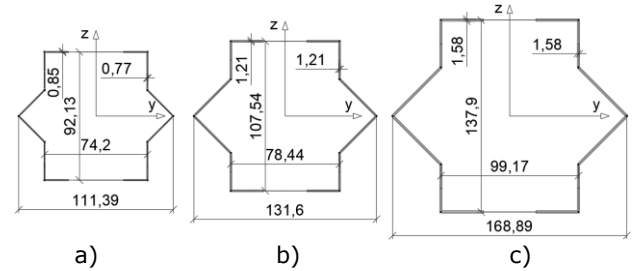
Cross-section geometry of optimized Type C column: a) – column under 50 kN axial load; b) – column under 100 kN axial load; c) – column under 200 kN axial load
